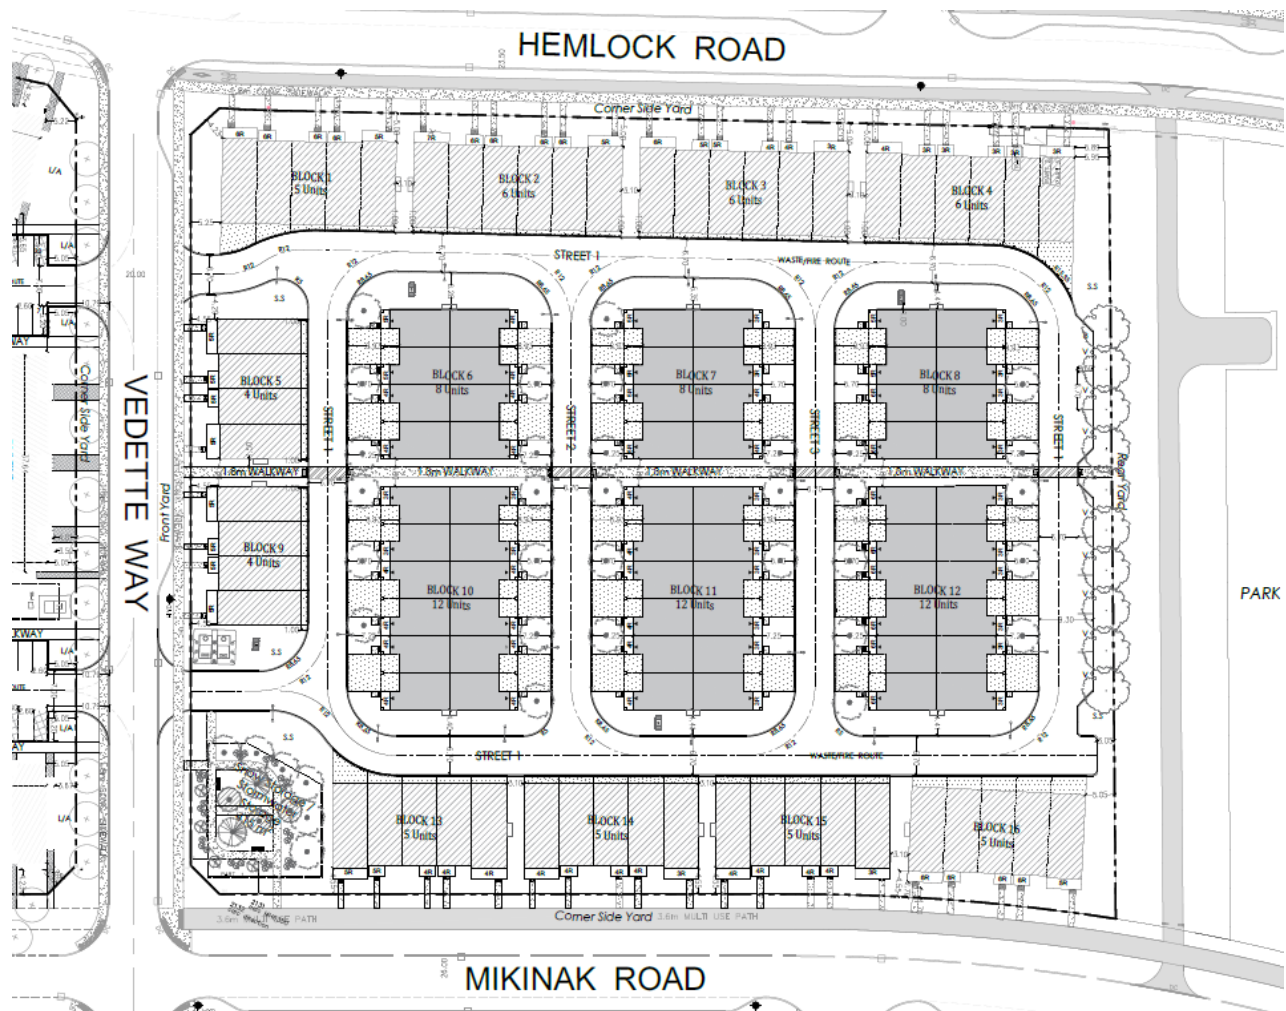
Site Plan excerpt (Korsiak Urban Planning)
